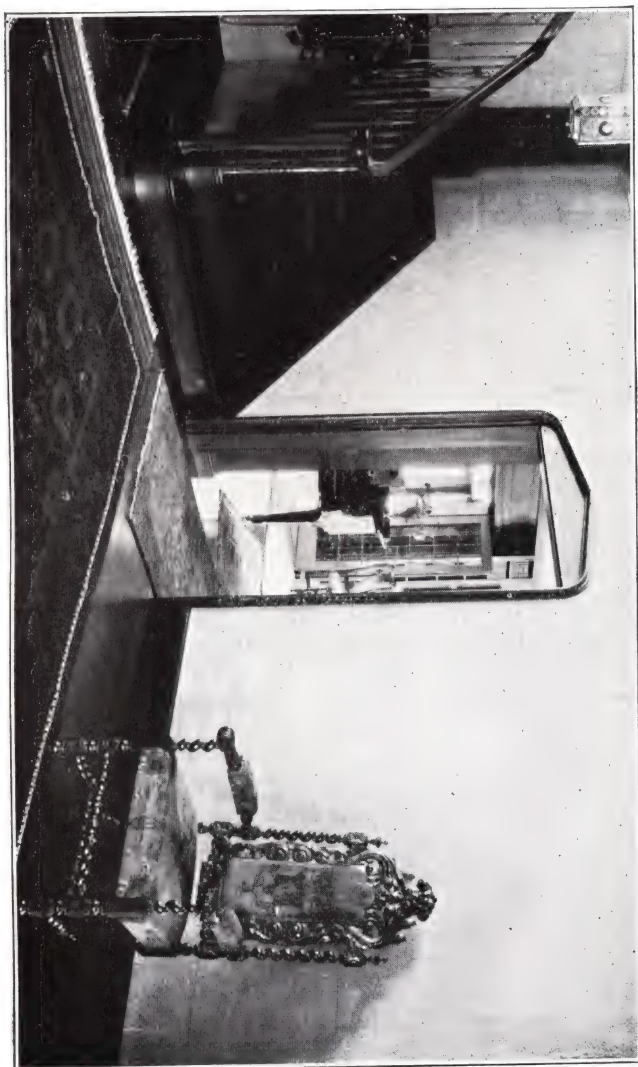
A General View of French Caen Stone Finish Marked Off in Blocks.
